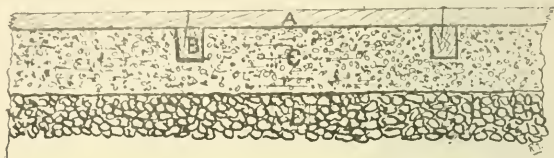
Concrete floor with boarded surface. A, floor boards; B, slips 2" \times 1½"; C, cement concrete 4" thick; D, rubble.
